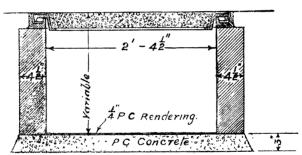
CHANNEL JOINT BOX, BRICKWORK. (J.F. 2.)
